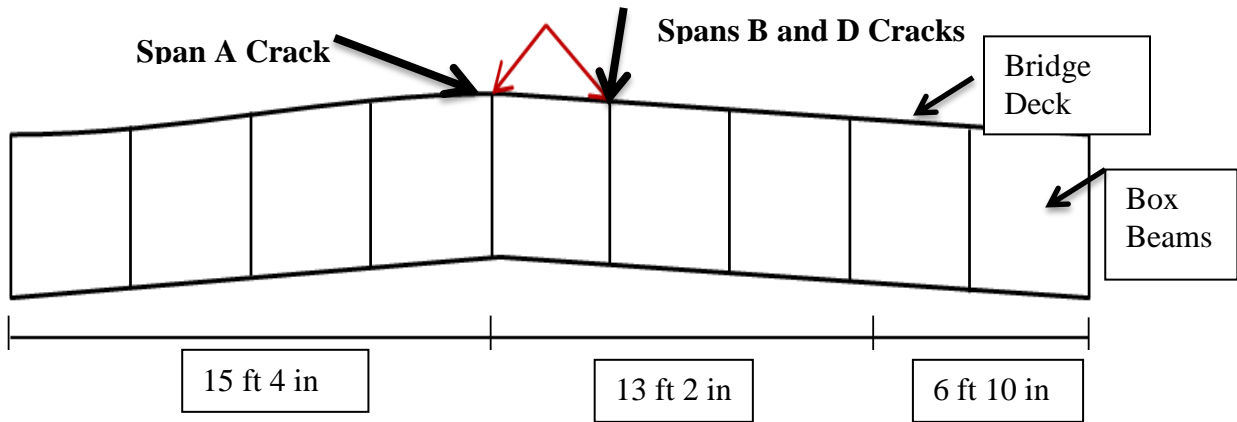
Approximate Locations of Longitudinal Cracking in Transverse Cross-Section View
